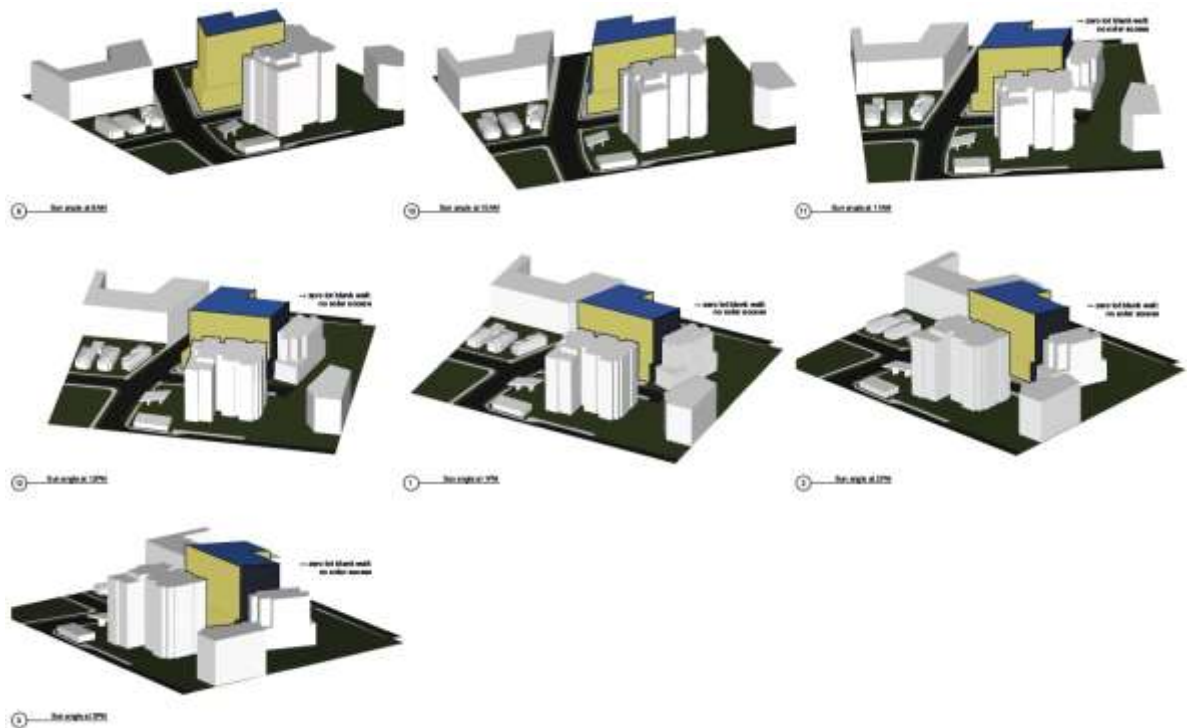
Extract from Drawing No. DA 409 showing constraints to solar access to the subject site
